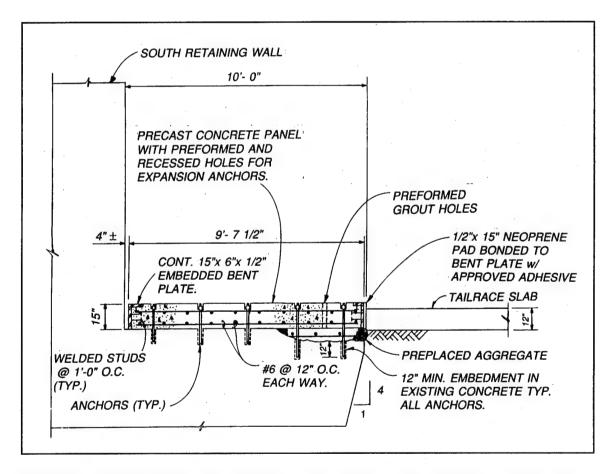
Spall repair at south retaining wall, Gavins Point Dam (from Harris, Palma, and Miller 1991)
